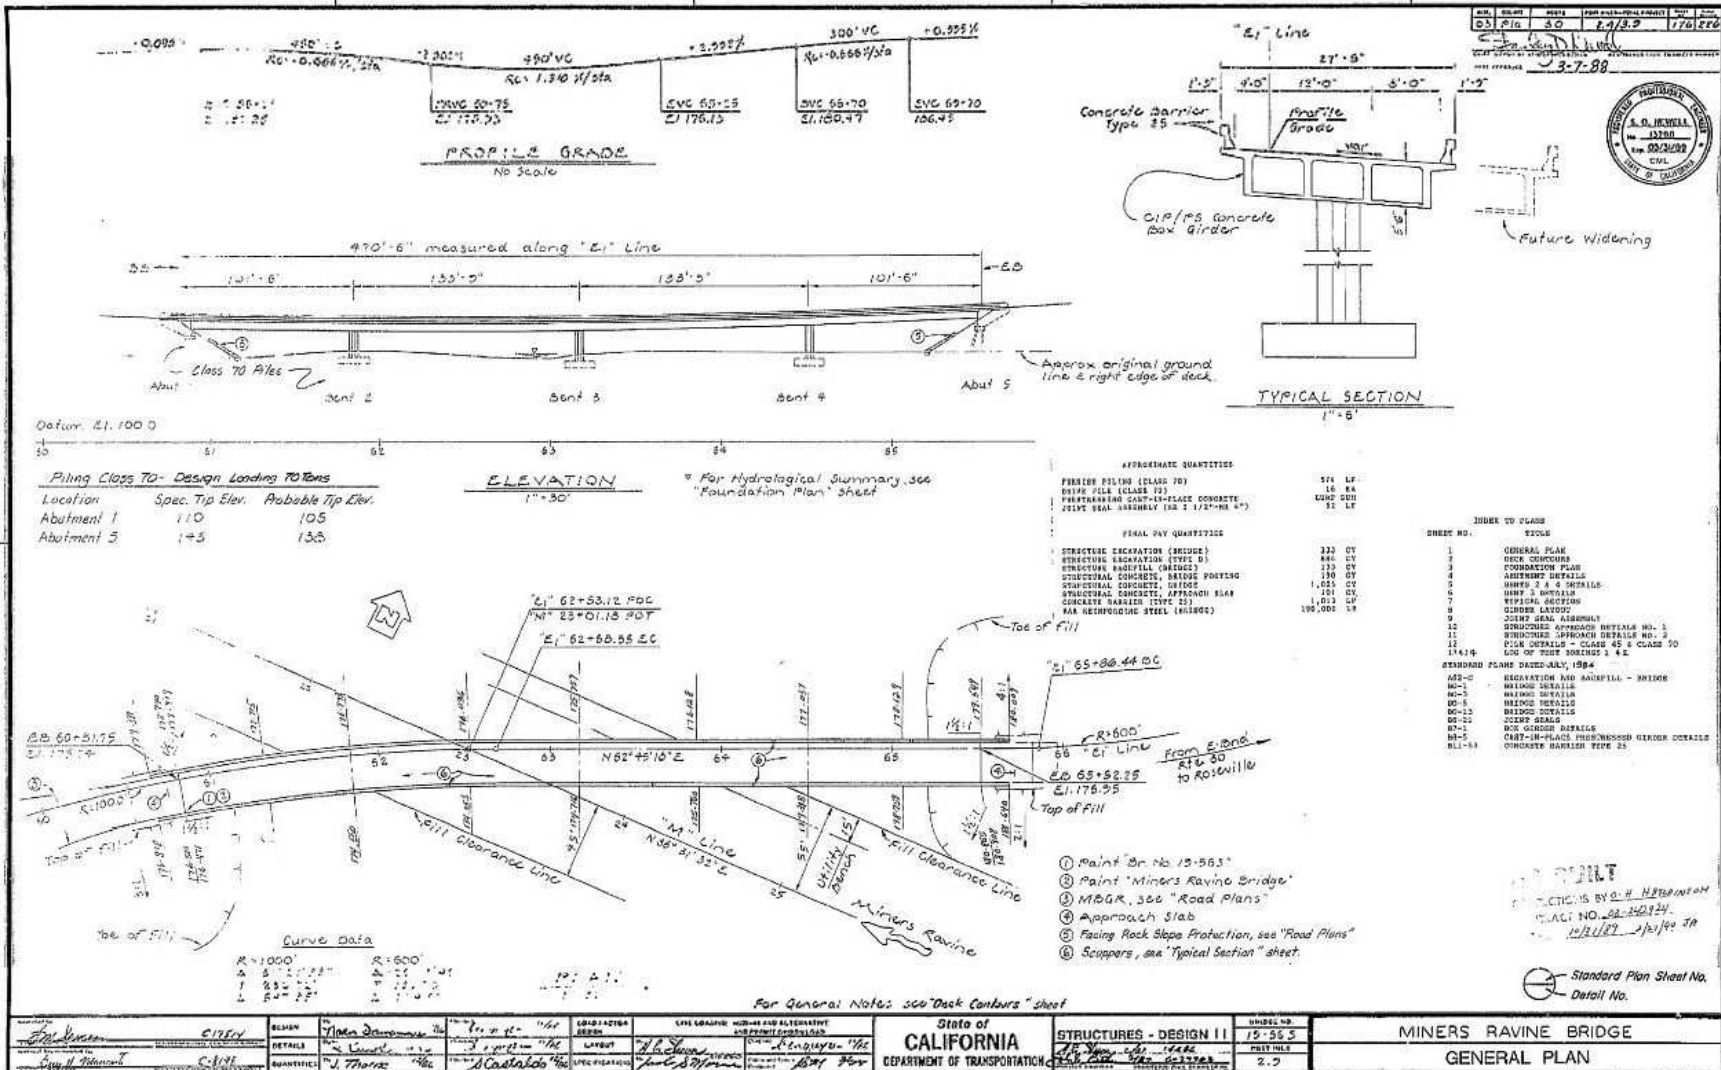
I-80 Off-Ramp to Eureka Road at Miners Ravine As-built Plan (1988)
